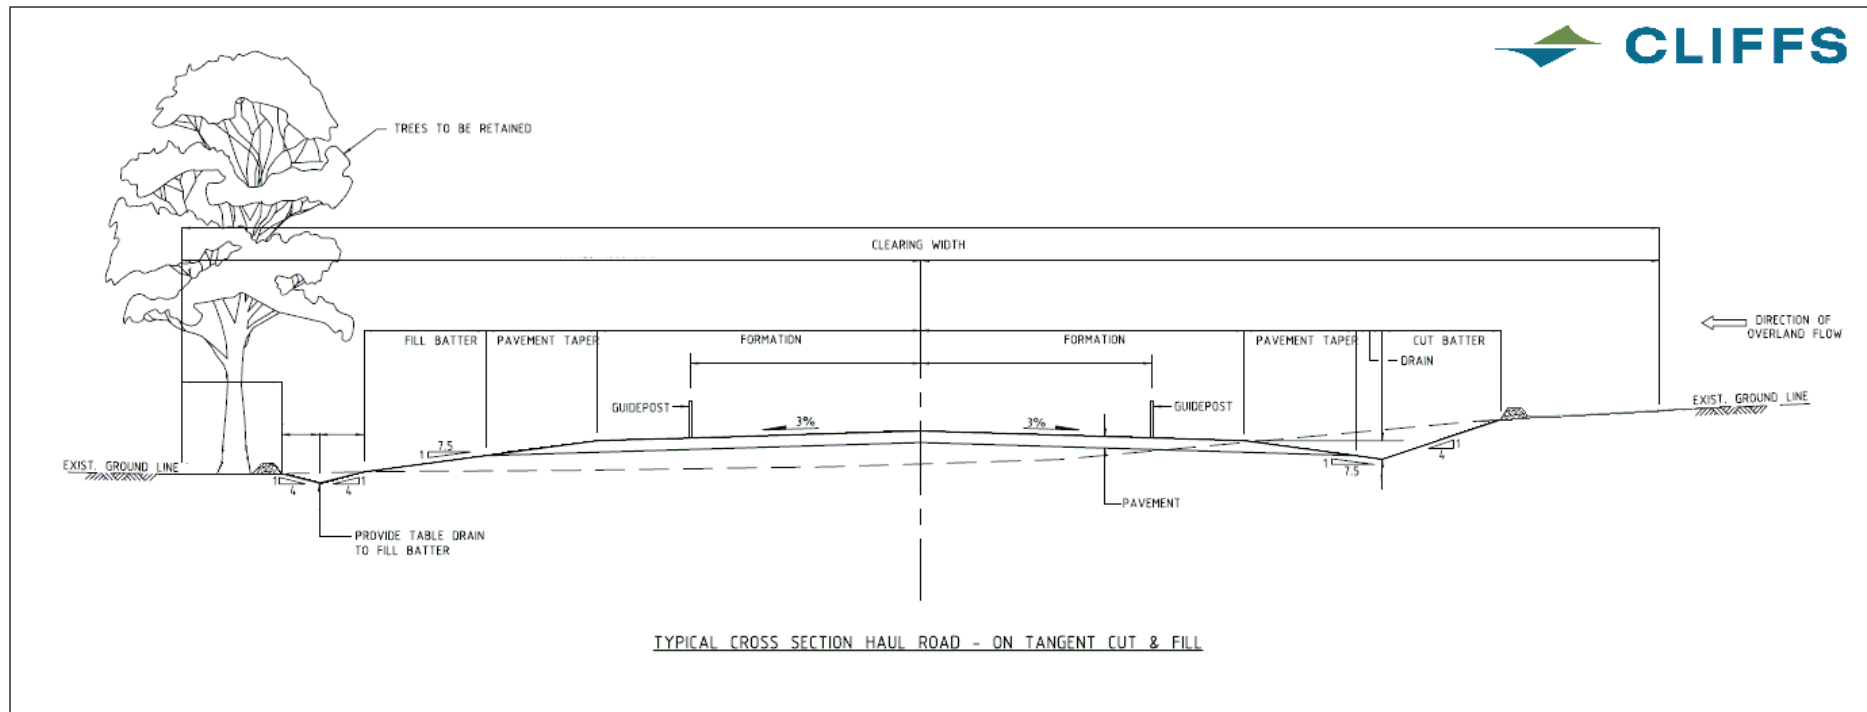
Windarling Range W4 East Deposit Haul Road Cross-section. The cross-section depicts a typical haul road design used by Cliffs at its mine operations. Source: adapted from RoadsWest Engineering Group WA Pty Ltd (2010 unpublished).
